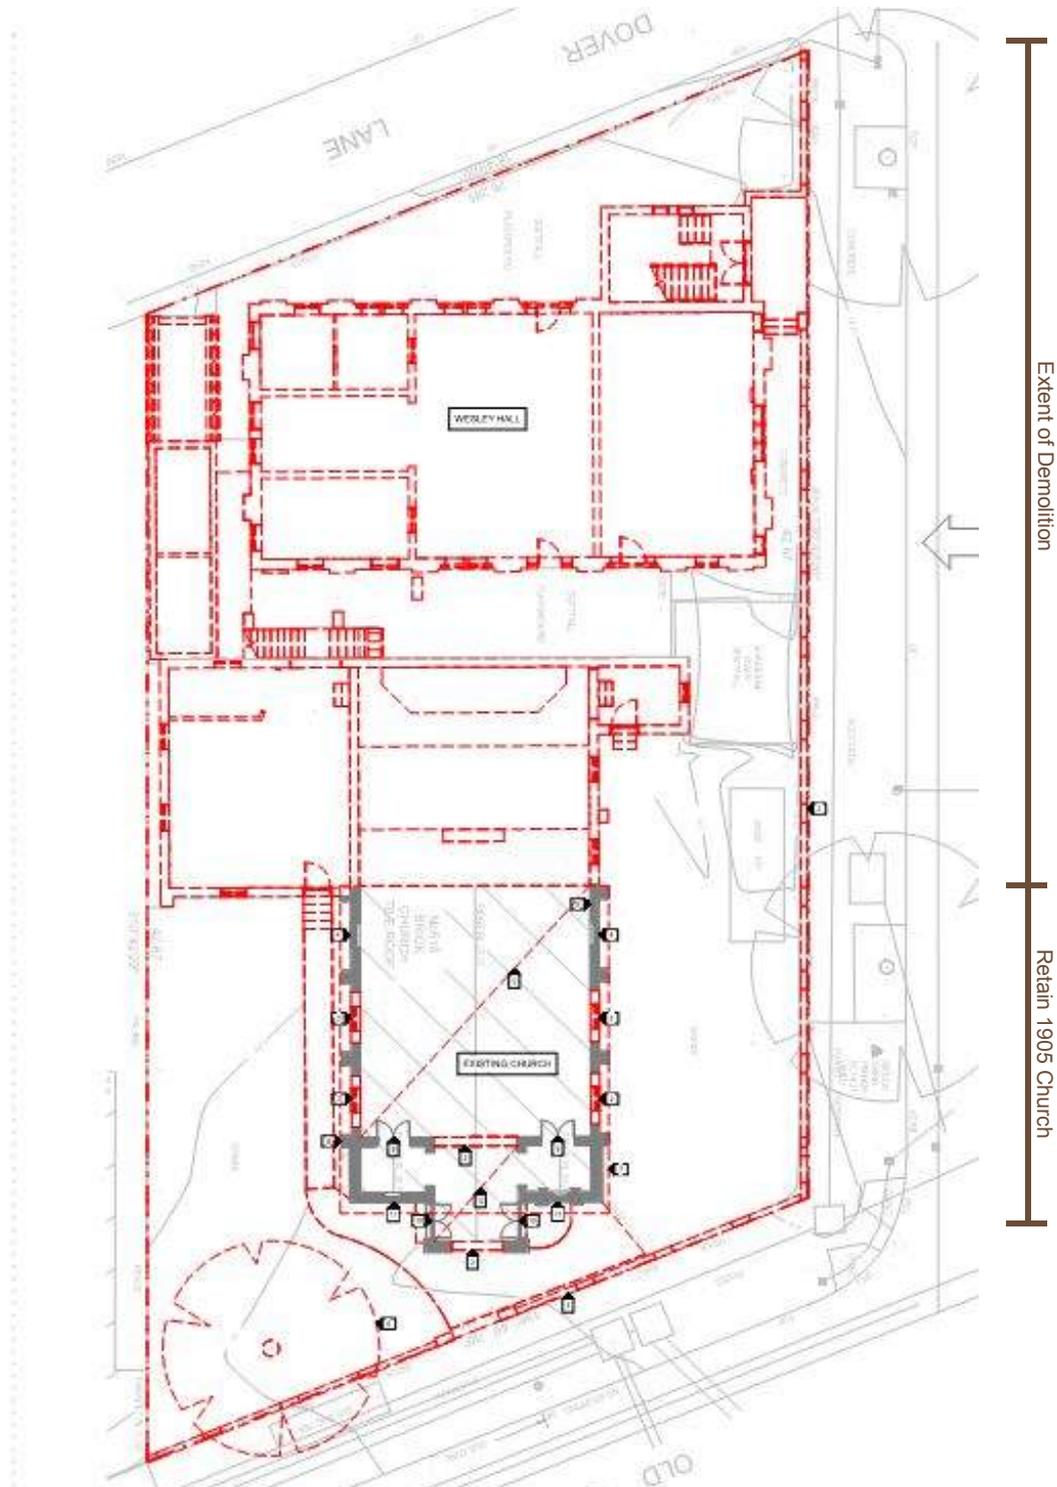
Existing and Demolition plan indicating the demolition of Wesley Hall, all associated outbuildings and the extent of demolition and retention of the church.
